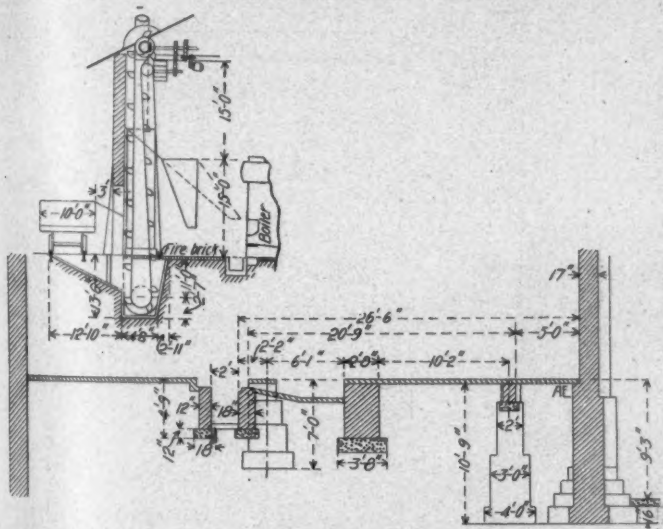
Sections in Boiler Room Showing Boiler Foundations and Coal Elevator.
